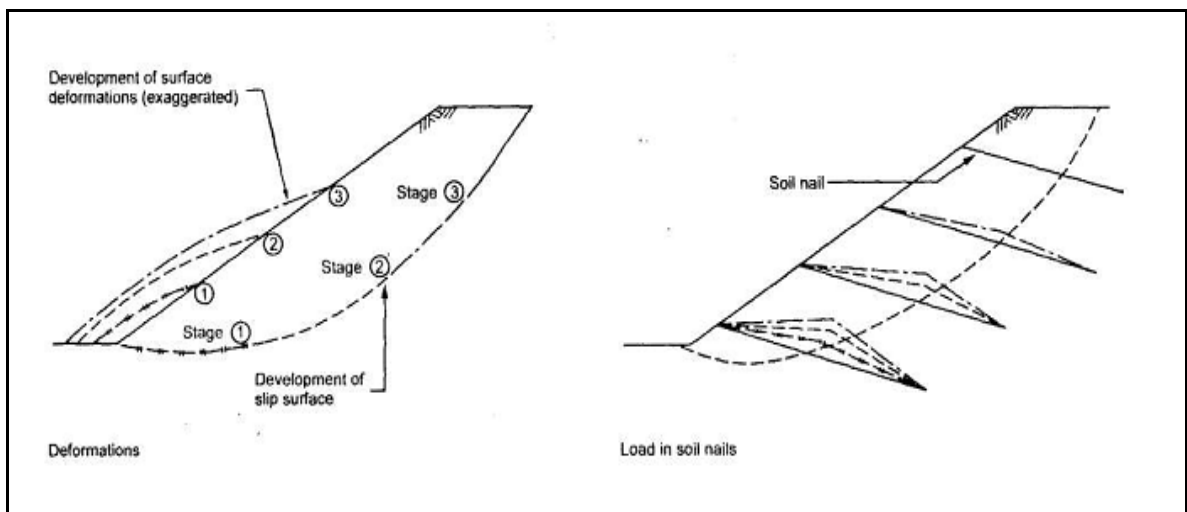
Development of deformations and loads in an existing slope stabilised by soil nails (with a flexible facing) (Phear *et al.*, 2005)
